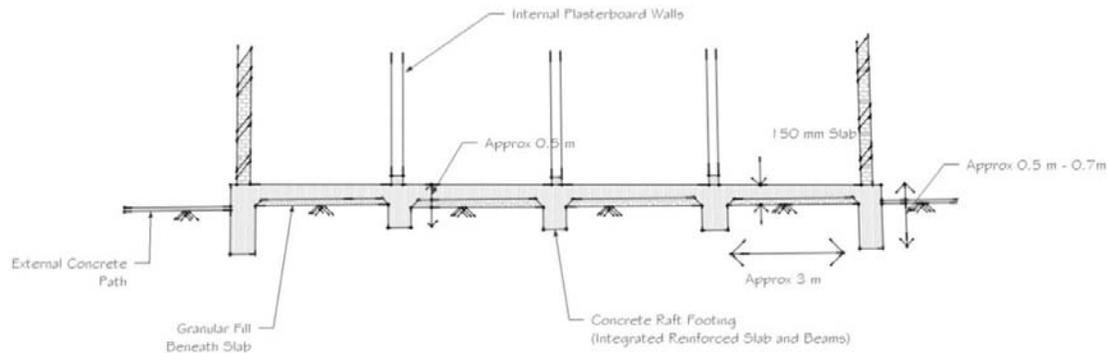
Conceptual House 3 - Concrete Raft Slab on Ground
